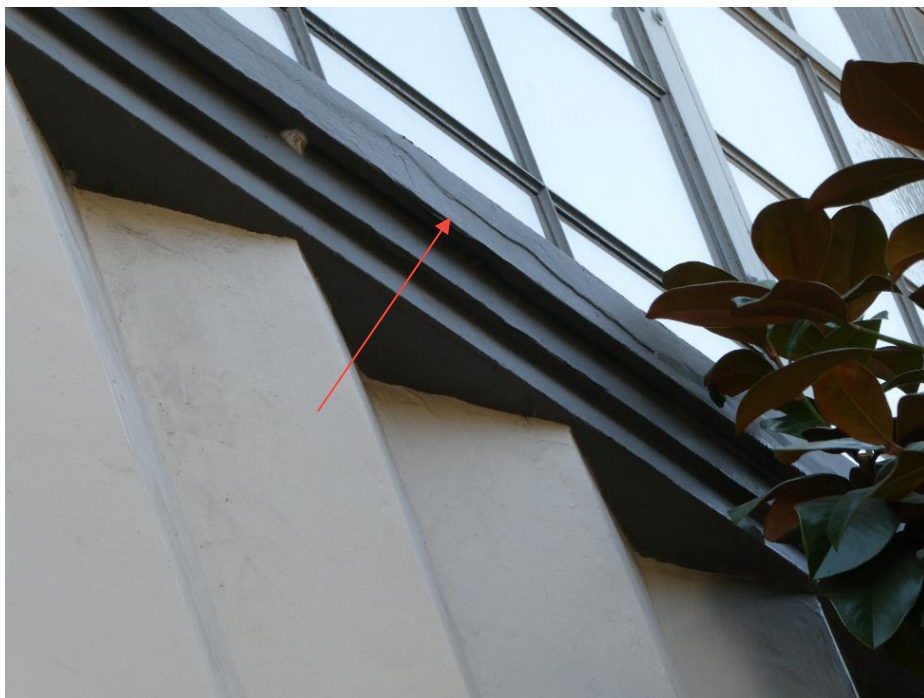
Horizontal crack below the second-floor window at the fourth bay from the east, has since been painted over. (Page & Turnbull, 2024)
